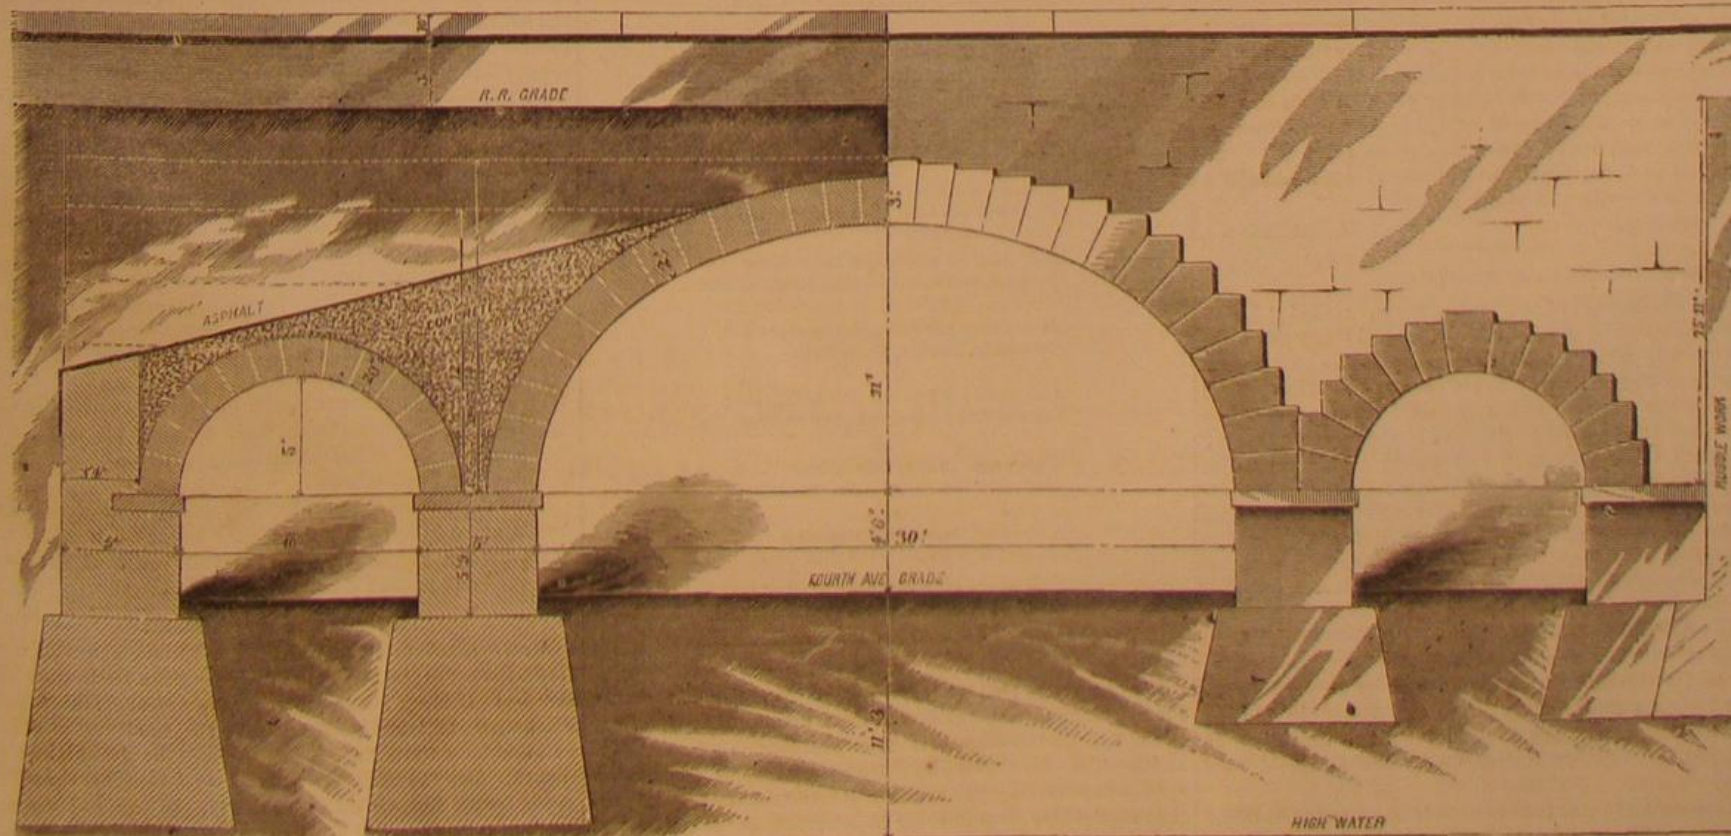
THE UNDERGROUND RAILWAY, NEW YORK CITY.—SIDE ELEVATION OF VIADUCT AT STREET CROSSINGS.
